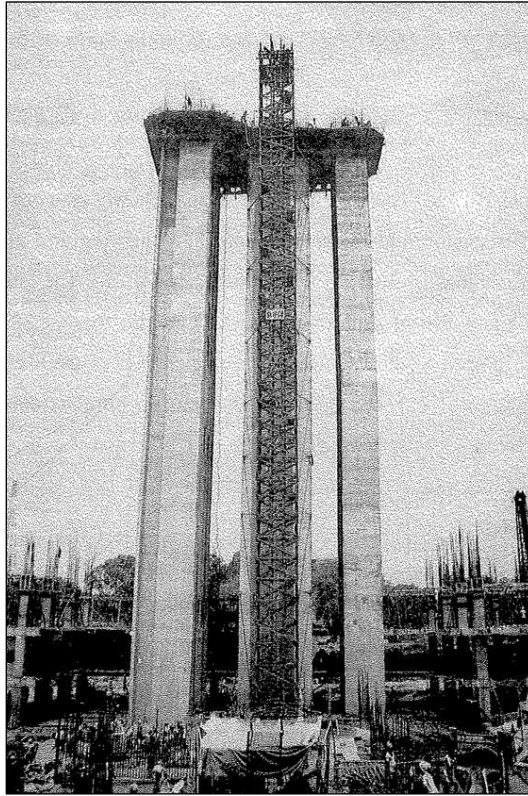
Bharat Hotels Elevator Core Under Construction Using Slipform.
